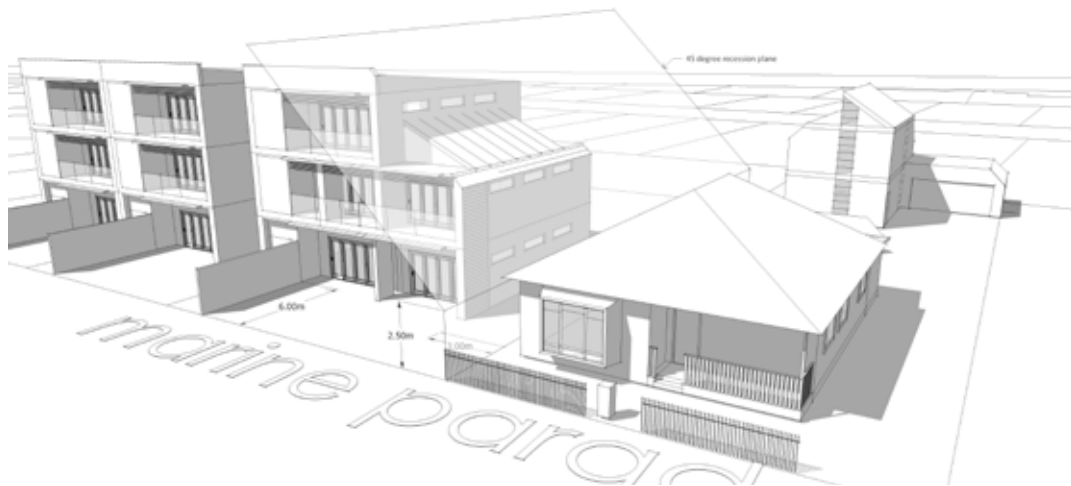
EXISTING RECESSION PLANES AND SIDE YARD CONTROLS
